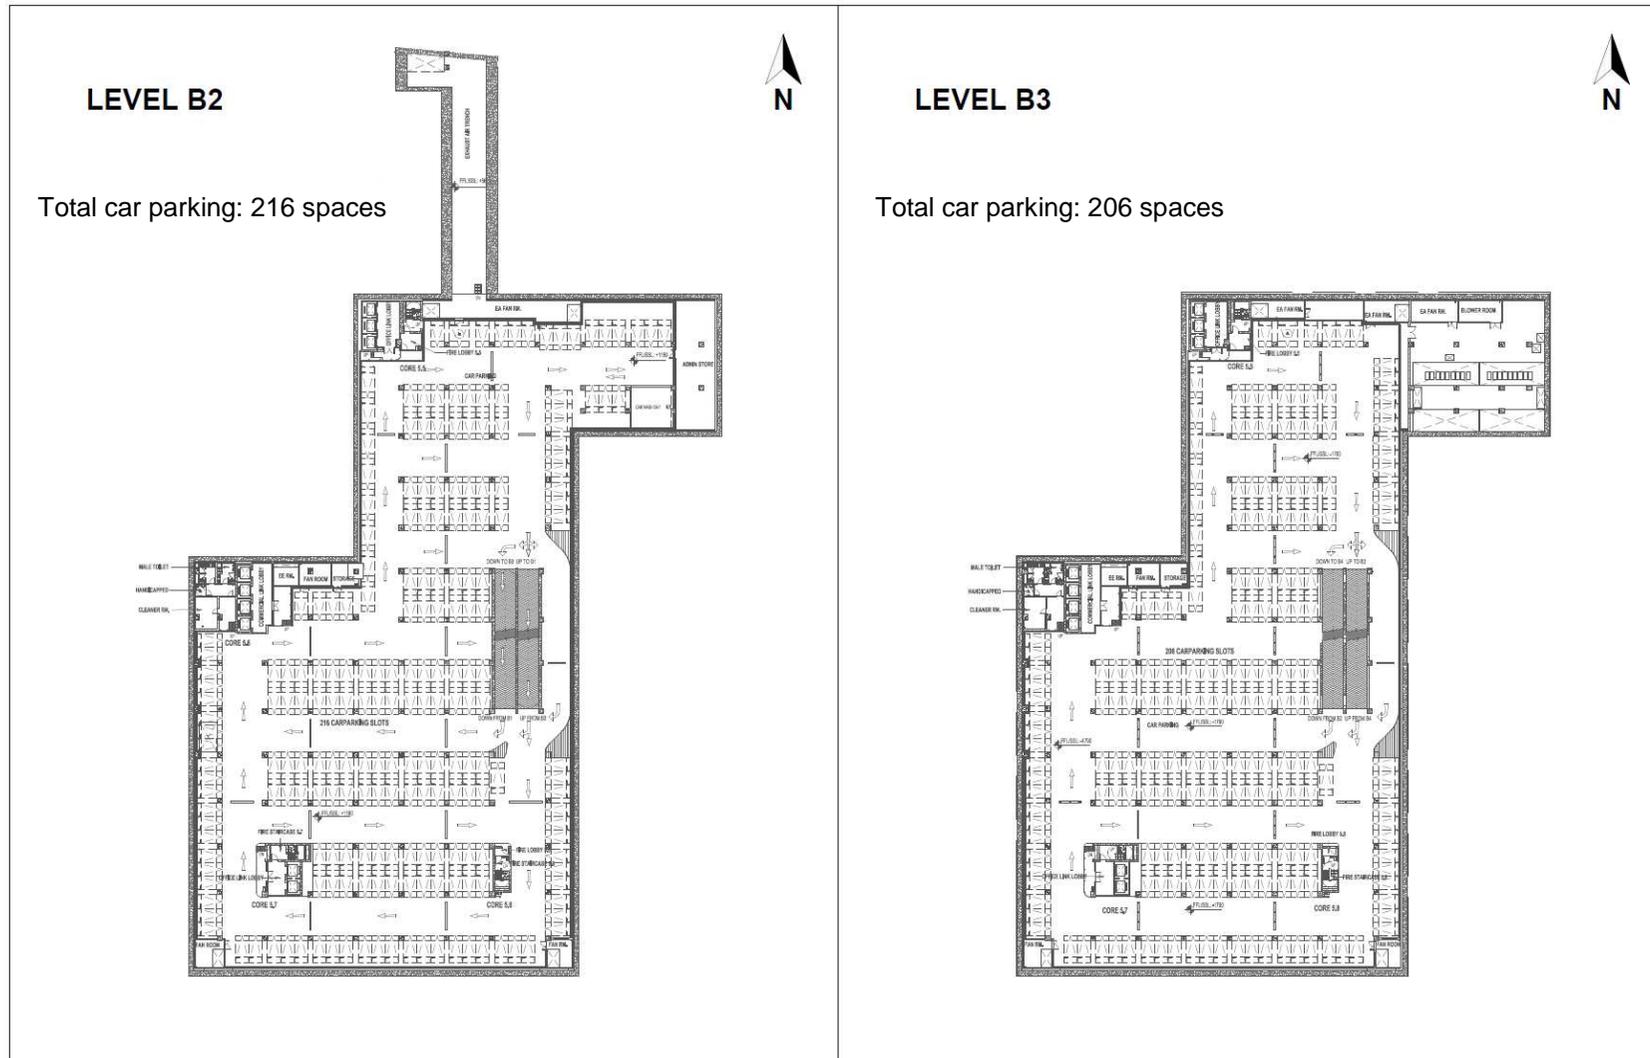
Parking Provision on Basement 2 and Basement 3
